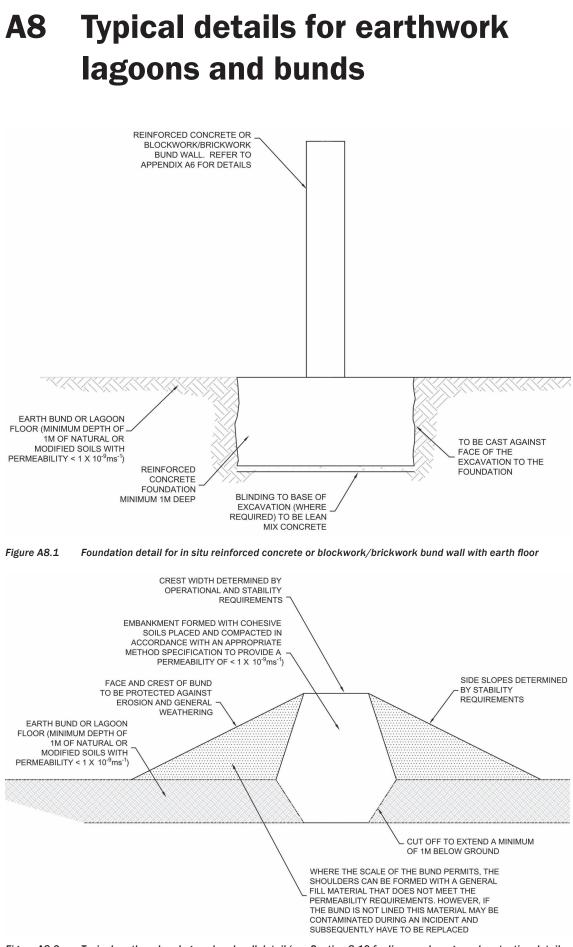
Typical earthwork or lagoon bund wall detail (see Section 8.10 for liner anchorage and protection details and pipe penetration details)
